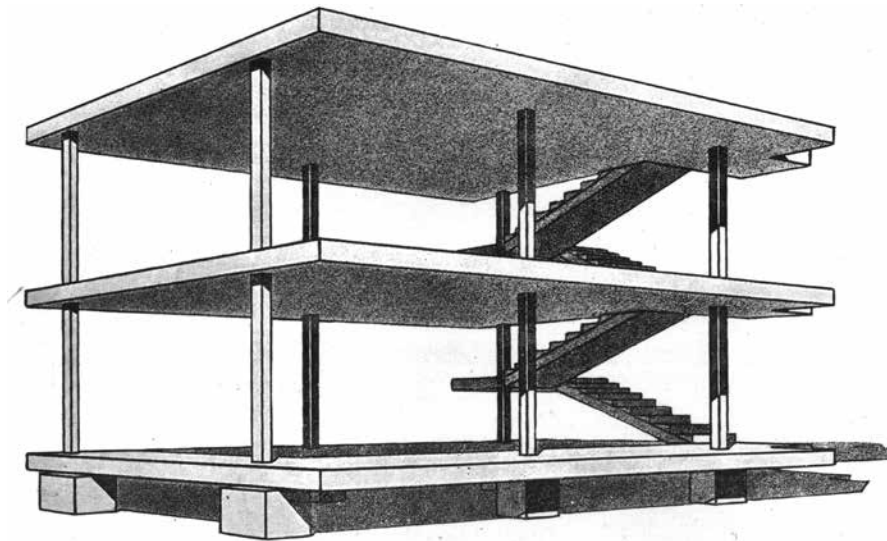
Example of a hard system using a concrete slab and columns, Le Corbusier's Dom-ino House.
